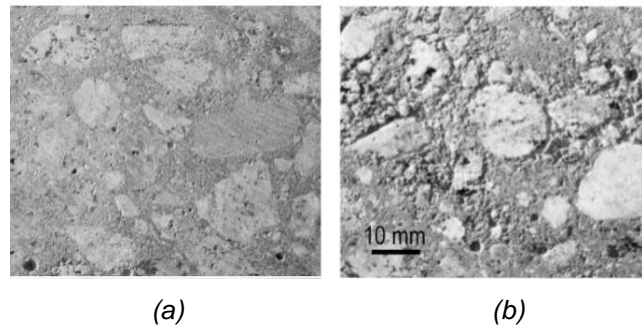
Sawn concrete surface (a) before concrete ice abrasion test; (b) after 3 km concrete ice abrasion test.
